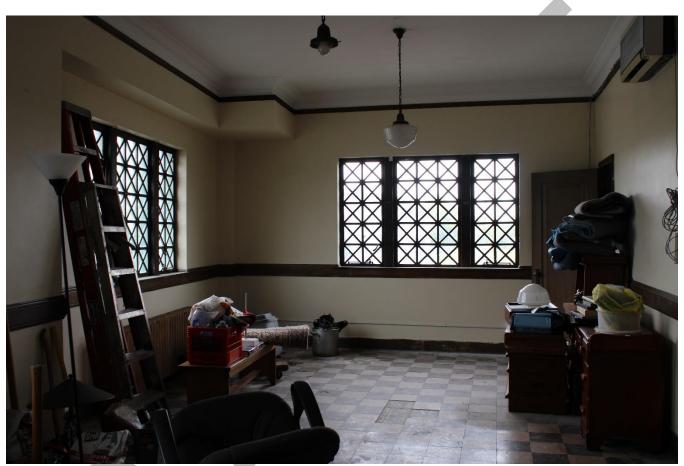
View showing a fourth-floor office with original finishes and trim; camera facing south.
